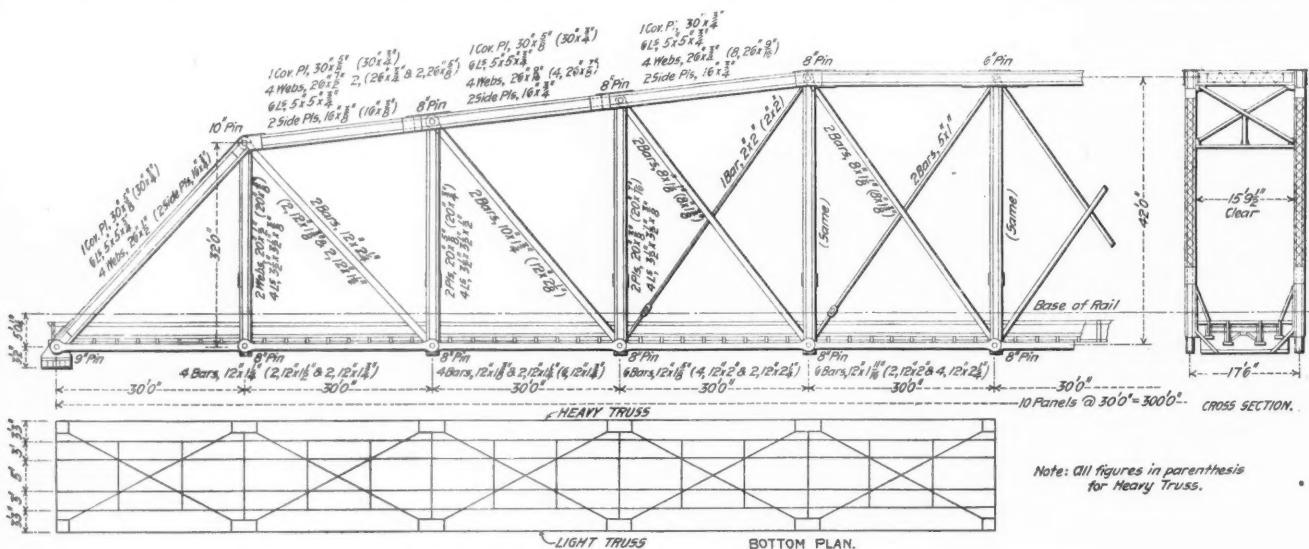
Details of 300-ft. Fixed Spans—Tennessee River Bridge.
